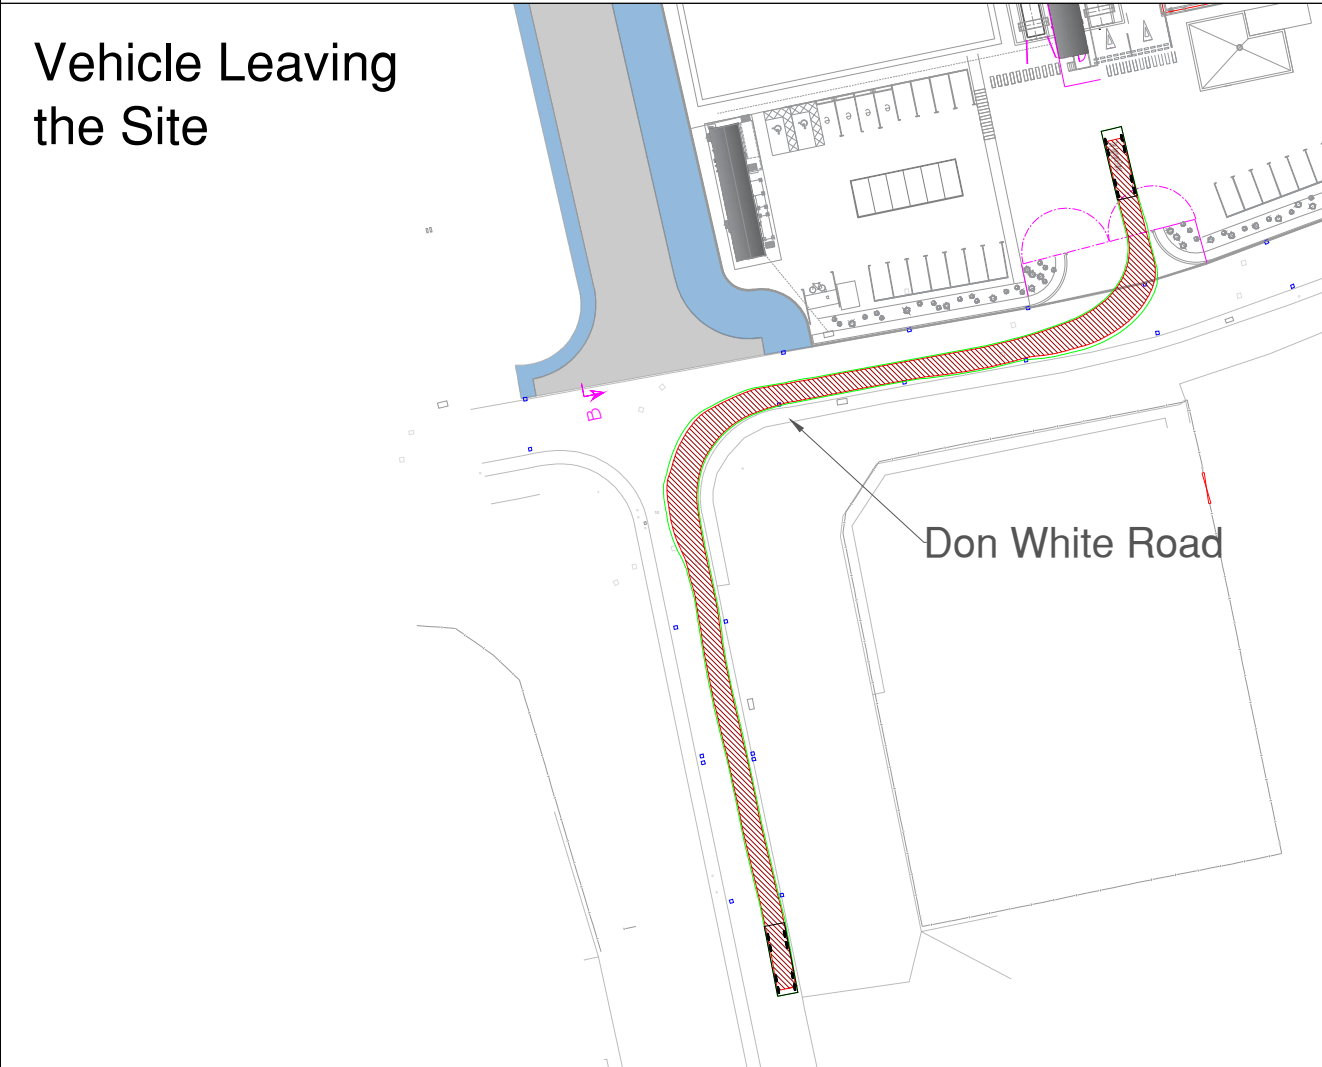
RLL-21-XX-DR-D-5003 Rev. B
